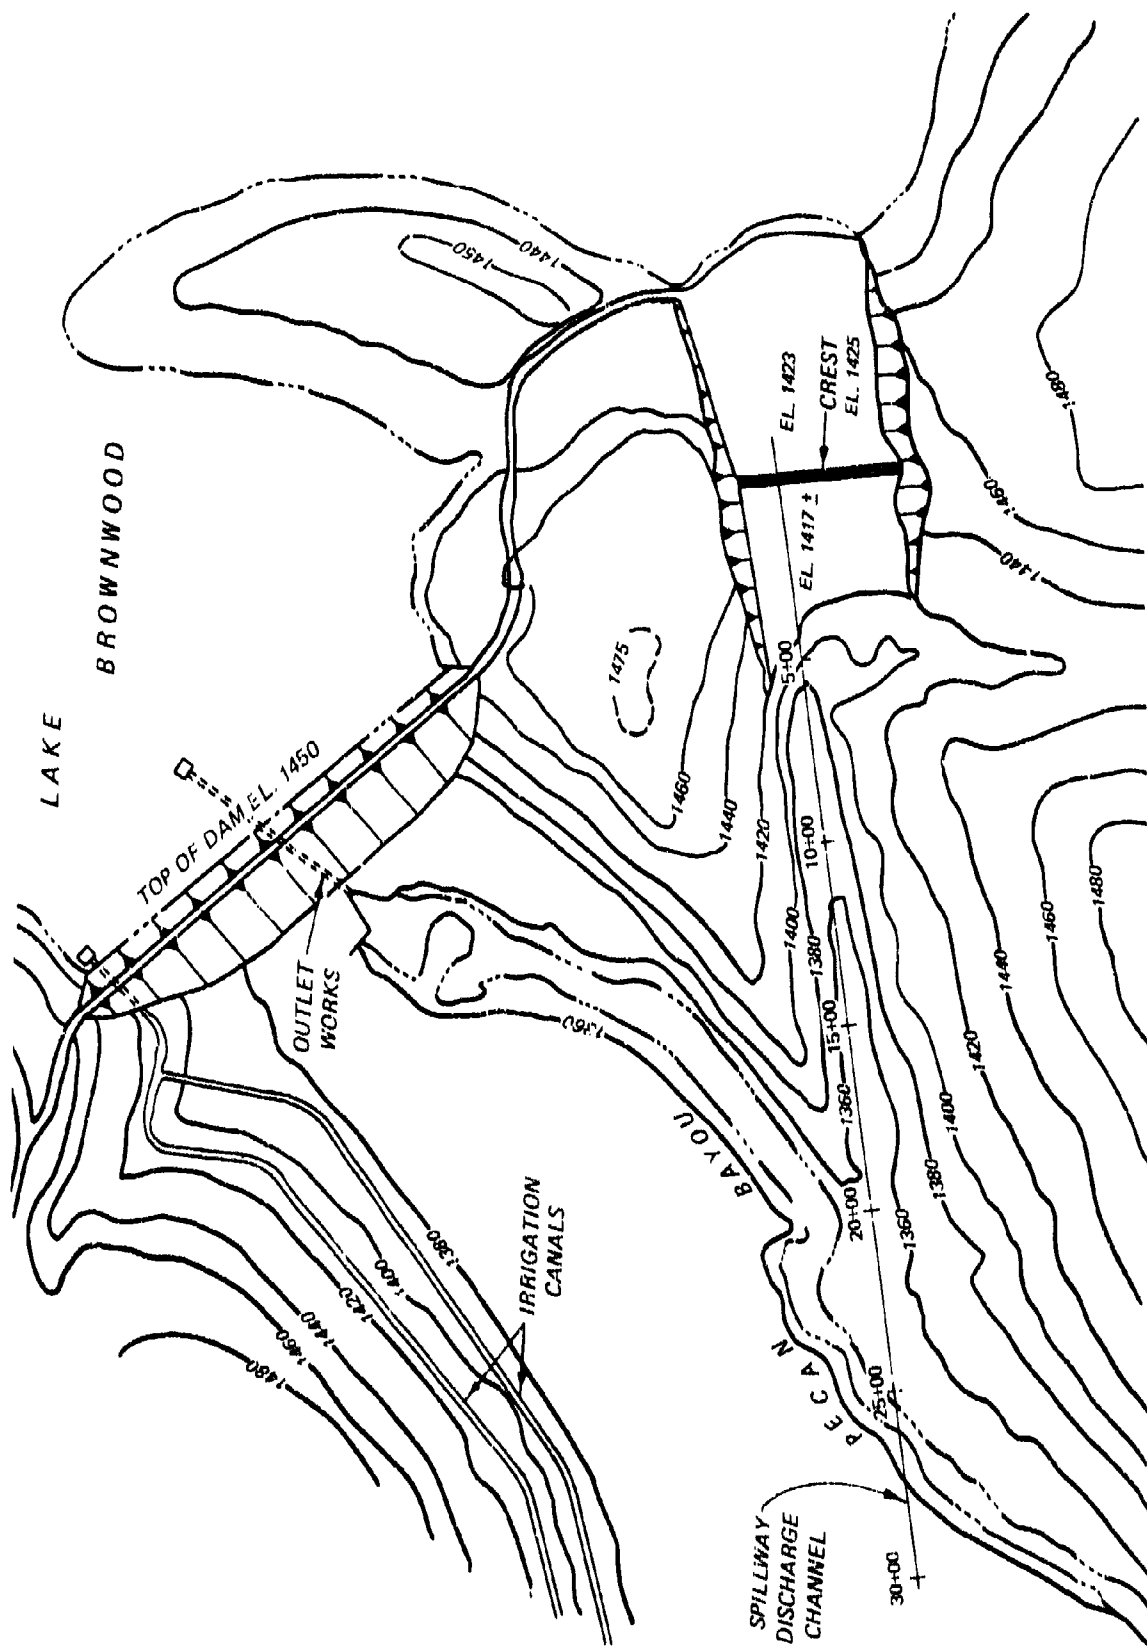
Lake Brownwood Dam. General plan of main embankment, outlet works, and emergency spillway
